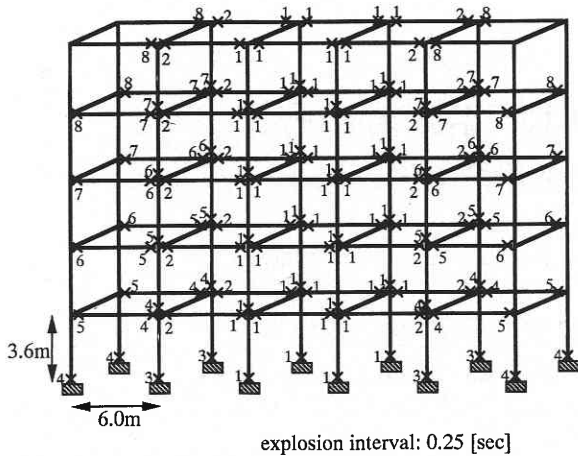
Explosive demolition analysis of a space frame using ASI technique
